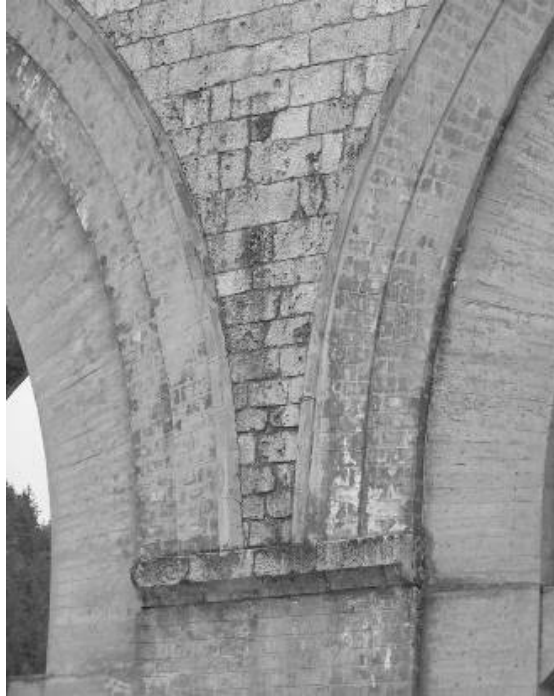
detail of one of the arches showing the brick structure and the concrete reinforcement of the vault (photo 2007).
